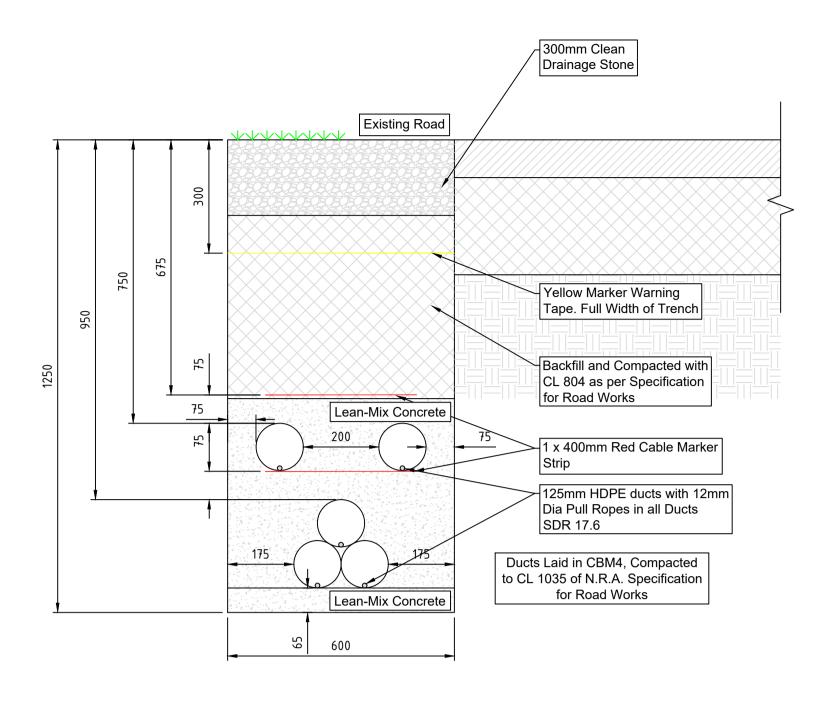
## DETAIL B - STANDARD TRENCH CROSSING UNDER EXISTING SERVICES
